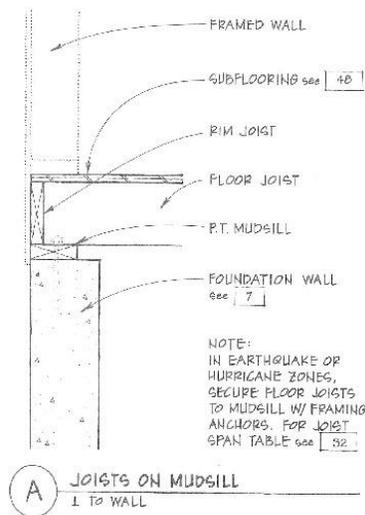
Joist Placement on Foundation (Thallen, 2000)
